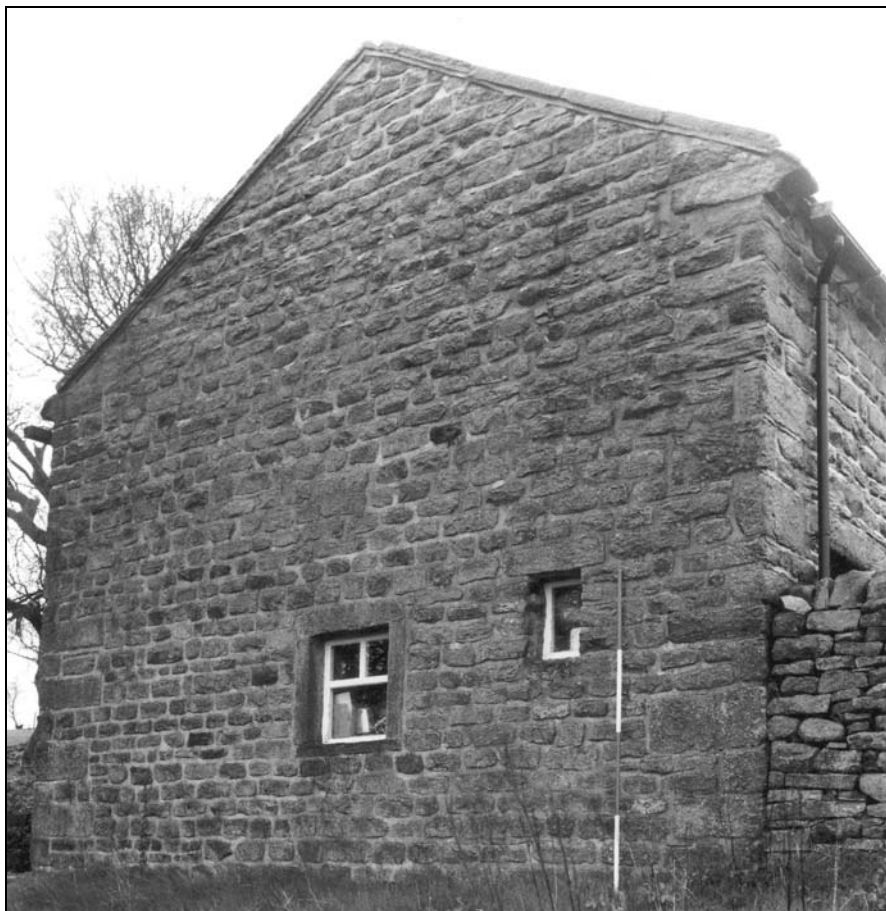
Rebuilt west gable, from the south-west (film 1, frame 18)
